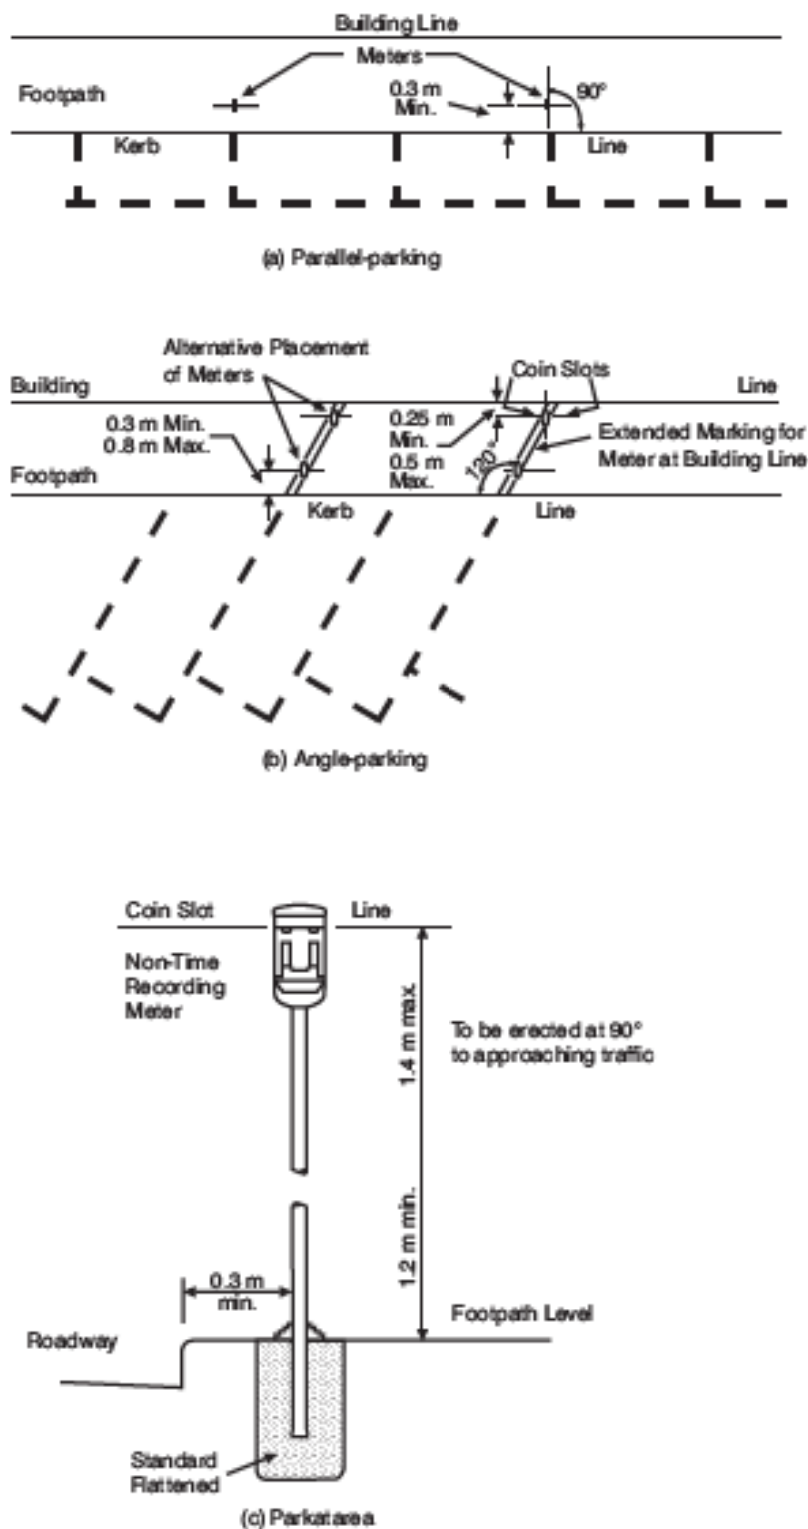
ERECTION OF PARKING METERS (PARKATAREAS) FOR PARALLEL AND ANGLE-PARKING - TYPICAL ARRANGEMENT
